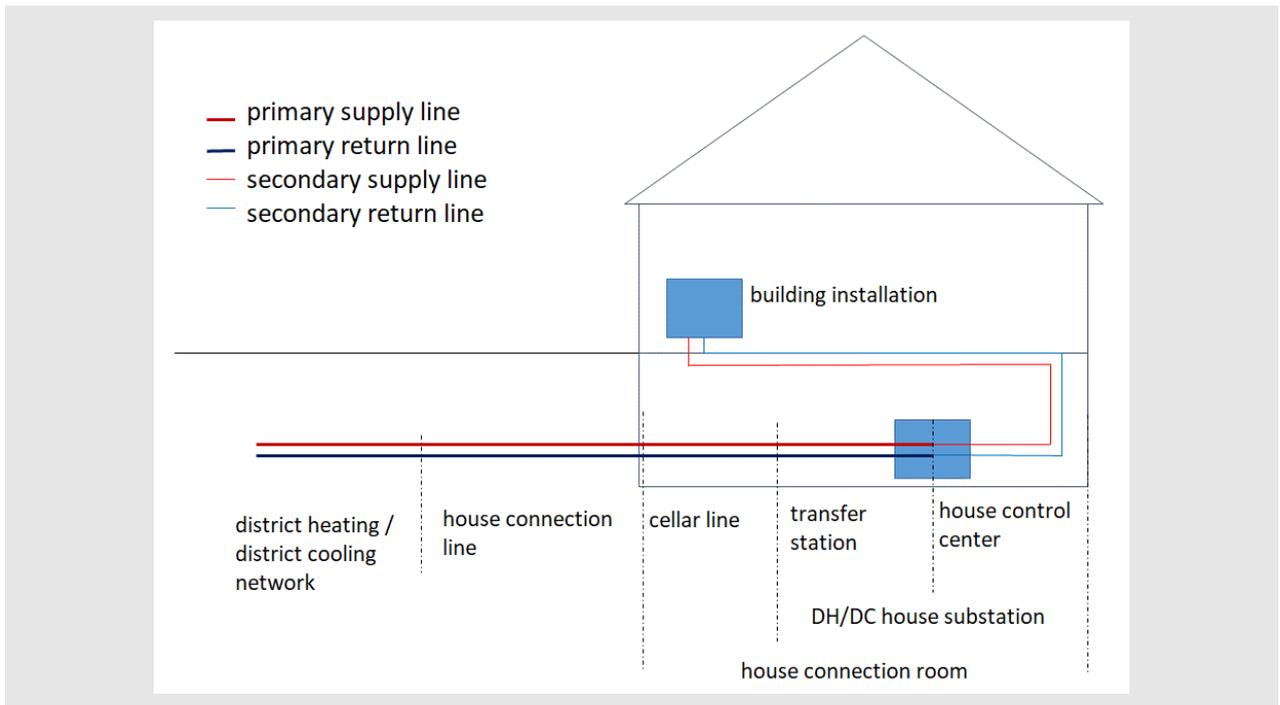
Heat transfer from the district heating/cooling network to the building using house substations
